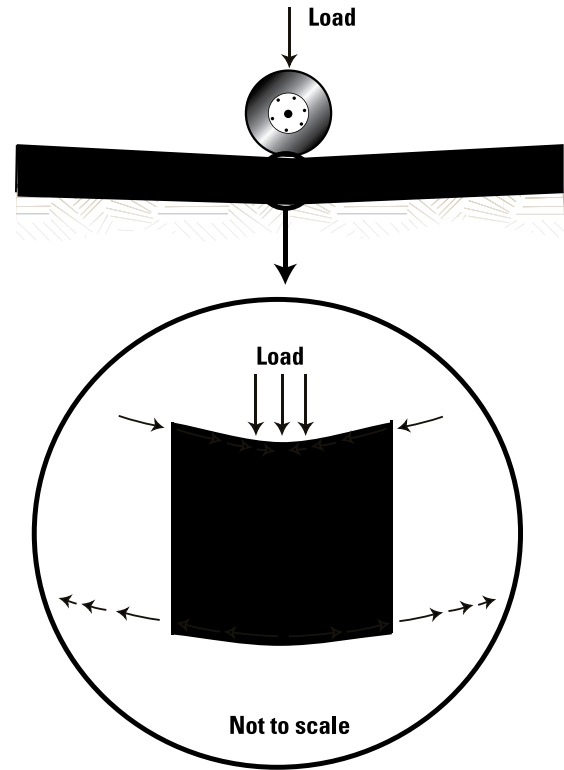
Loads on a pavement induce flexural stresses in the concrete slab. (ACPA 1994)
